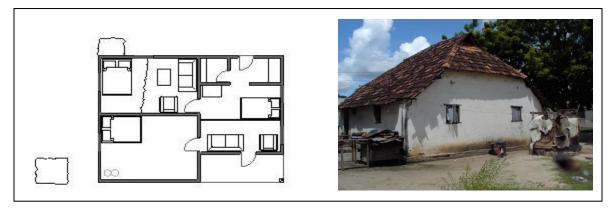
Mansard roofed house type with modified interior. A chipboard partition wall in the sitting room separates two families. These types of houses have deteriorated beyond repair. They have very small windows, which are inefficient for ventilation and enough light in the room.
